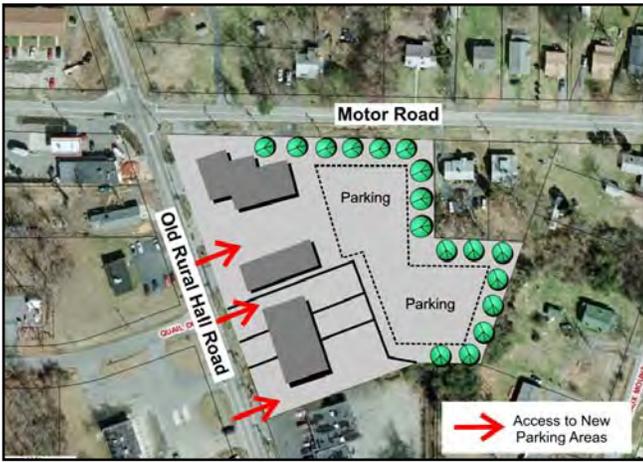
Comprehensive Redevelopment at Old Rural Hall Road and Motor Road
